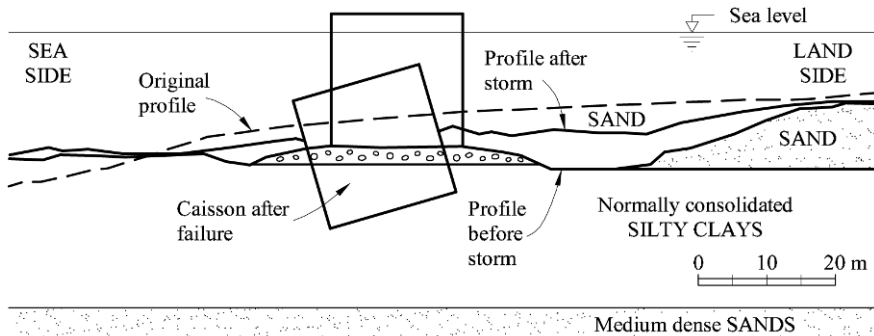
Cross-section through Caisson 3 before and after failure. Also shown is the original soil profile, the excavated profile, the granular berm, and the soil profile after the failure.
